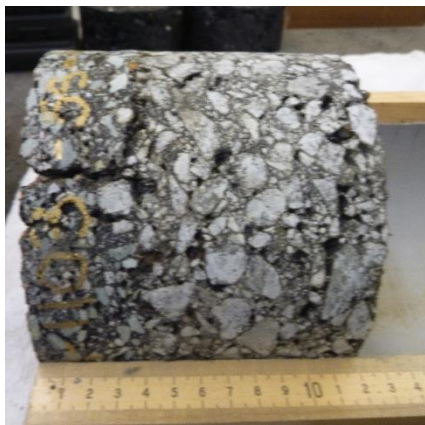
Section K, SR 631N, Core 5 Showing Top-down Cracking
